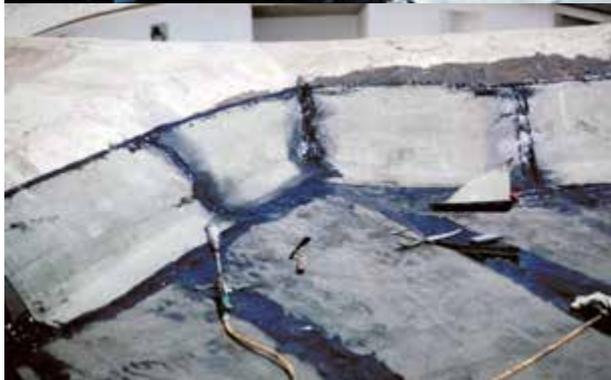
View of waterproofing membrane being laid at Gun No.2 emplacement.
